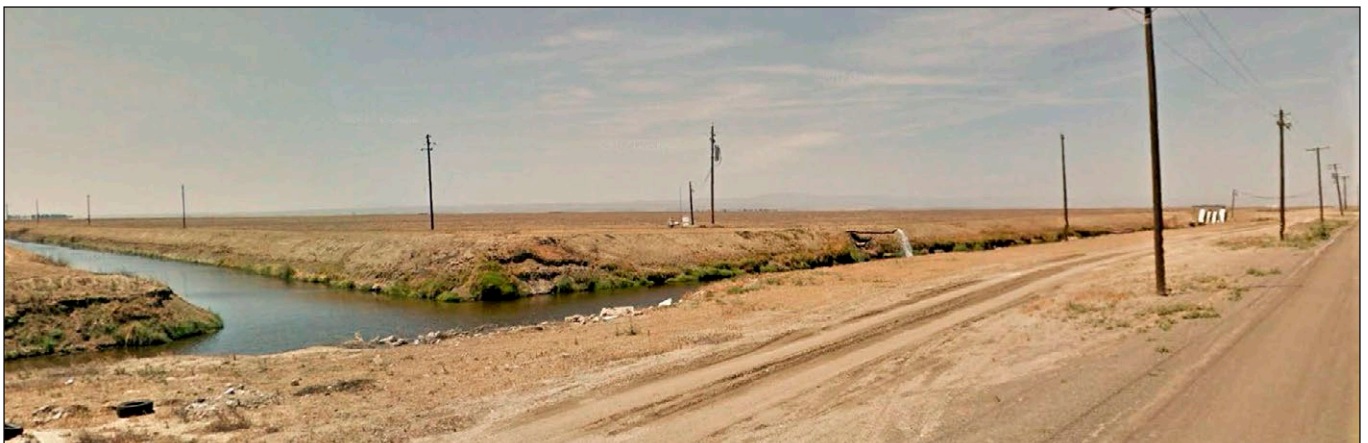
Southwestward view from Laurel Avenue at east edge of site.
